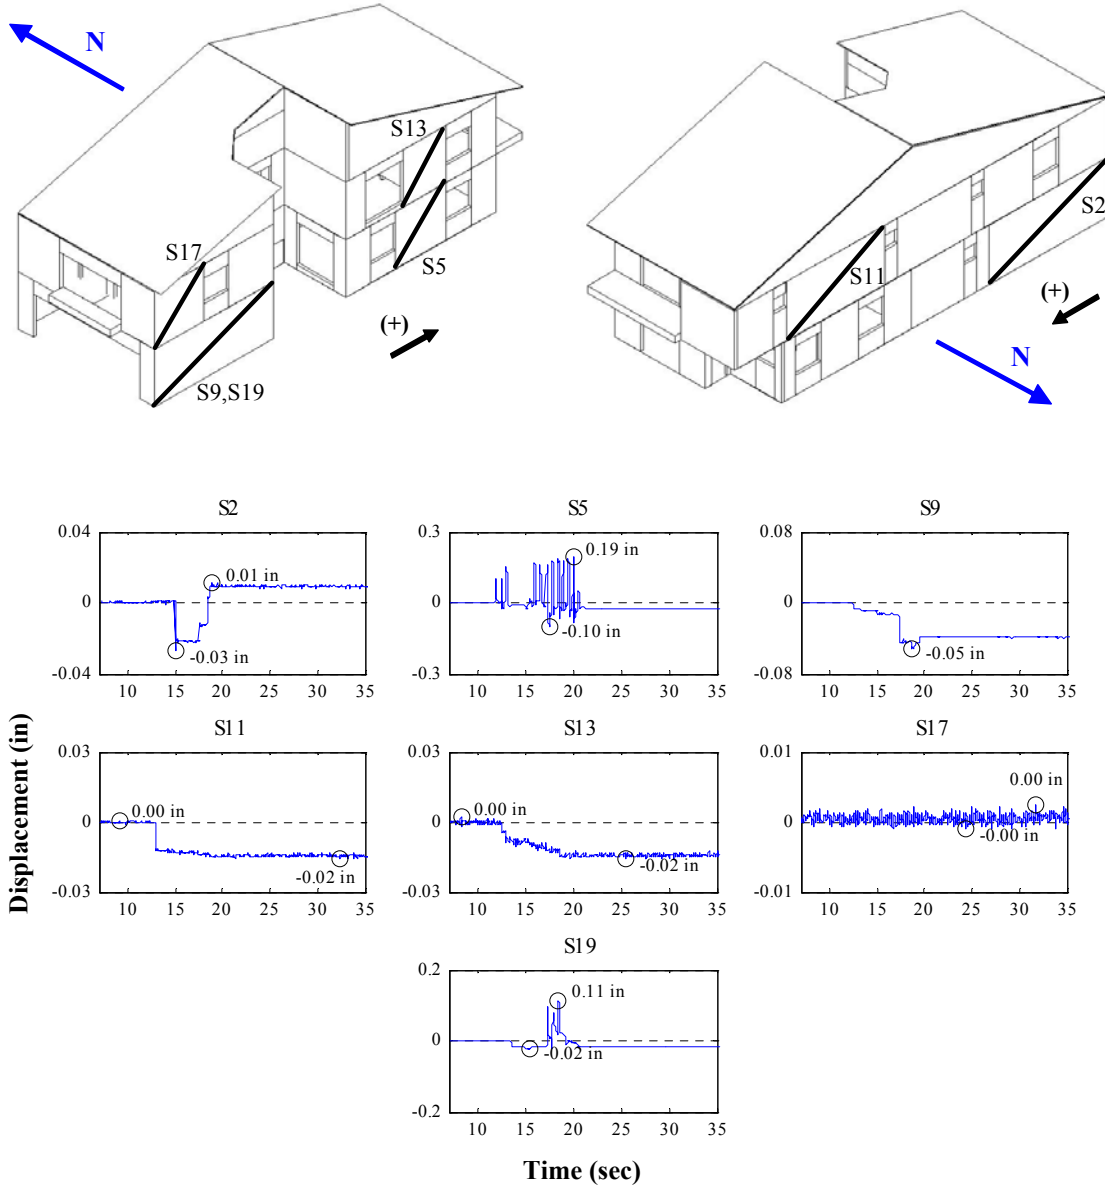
Wall deformations of east-west external walls for Test NWP5S06
